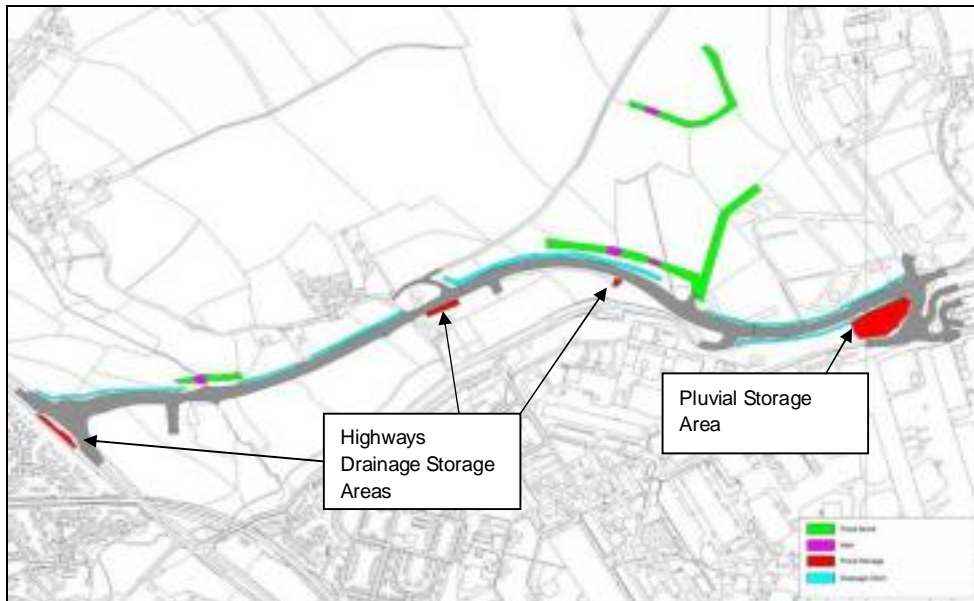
Location of Flood Bunds (Green) and Highways Drainage Storage Areas (Red) and Pluvial Mitigation Drainage Ditches (Blue)
